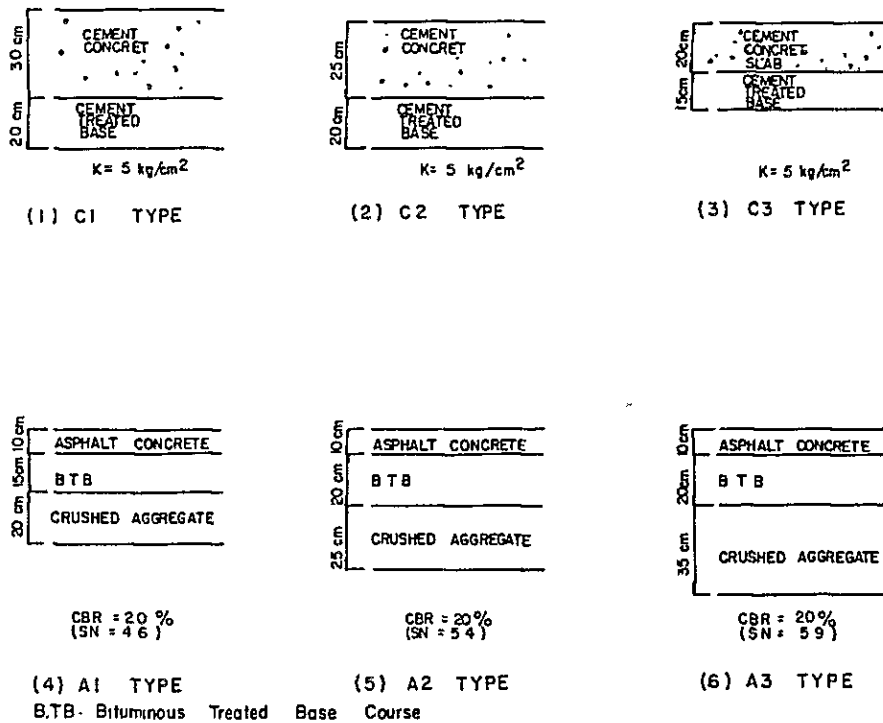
PROPOSED PAVEMENT STRUCTURES
